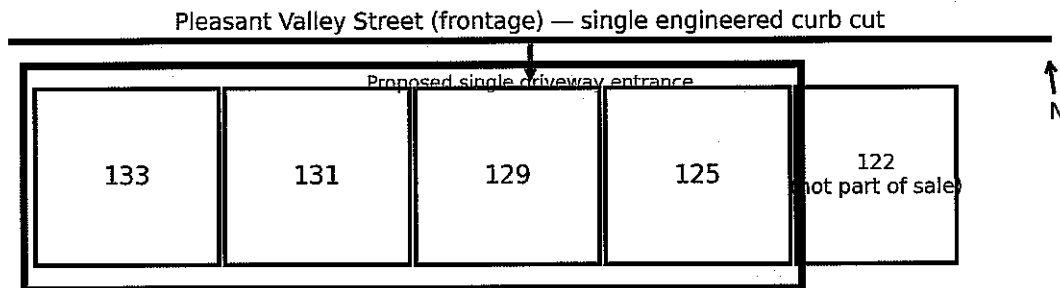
Exhibit A – Conceptual Plot Plan (One Unified Lot)
